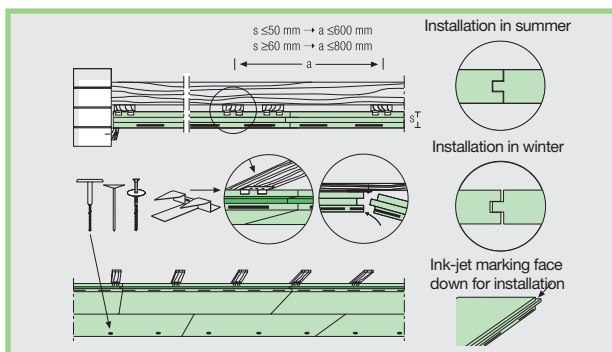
Installation instructions for Styrodur® C in ceilings.
